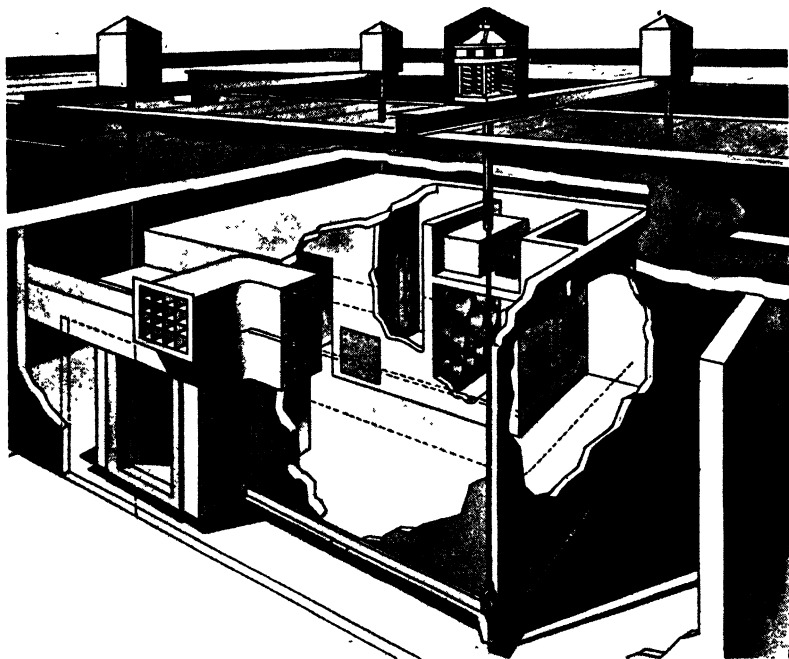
A METHOD OF INSULATING A SINGLE ROOM
